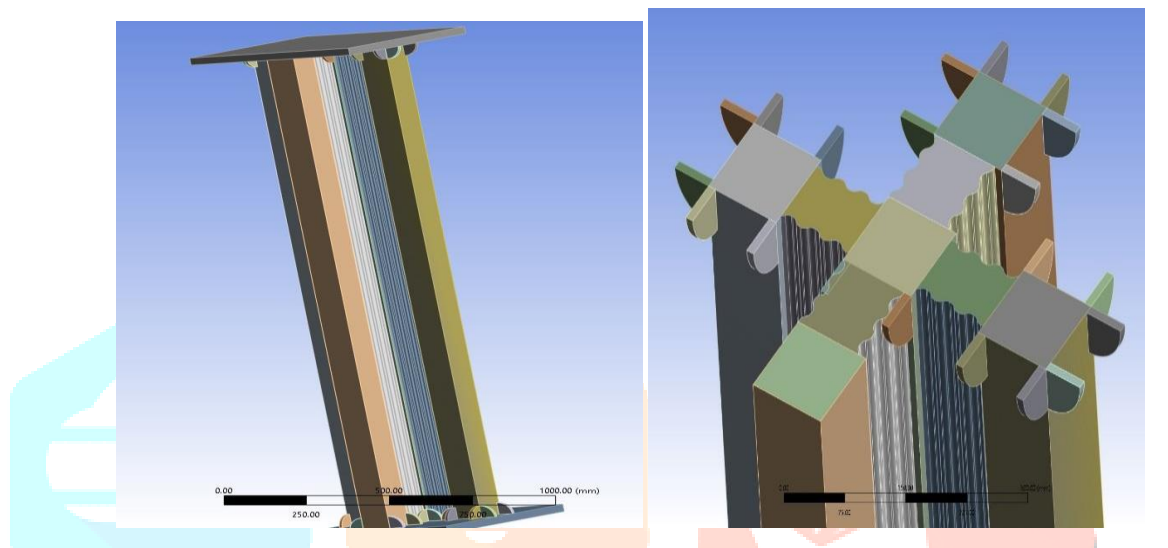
Cross-shaped CFST Column with Sinusoidal Corrugated Steel Plates
